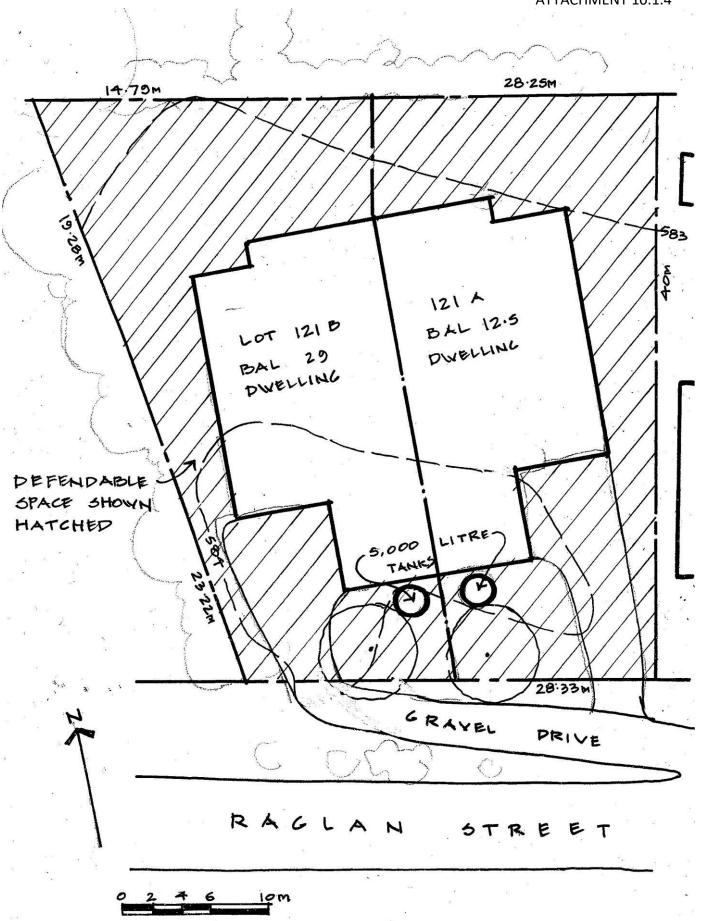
Defendable Space, access and water supply plan (See notes on the following page)
